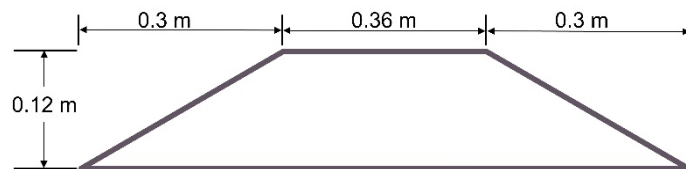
A descriptive dimensions of the trapezoidal bump.
